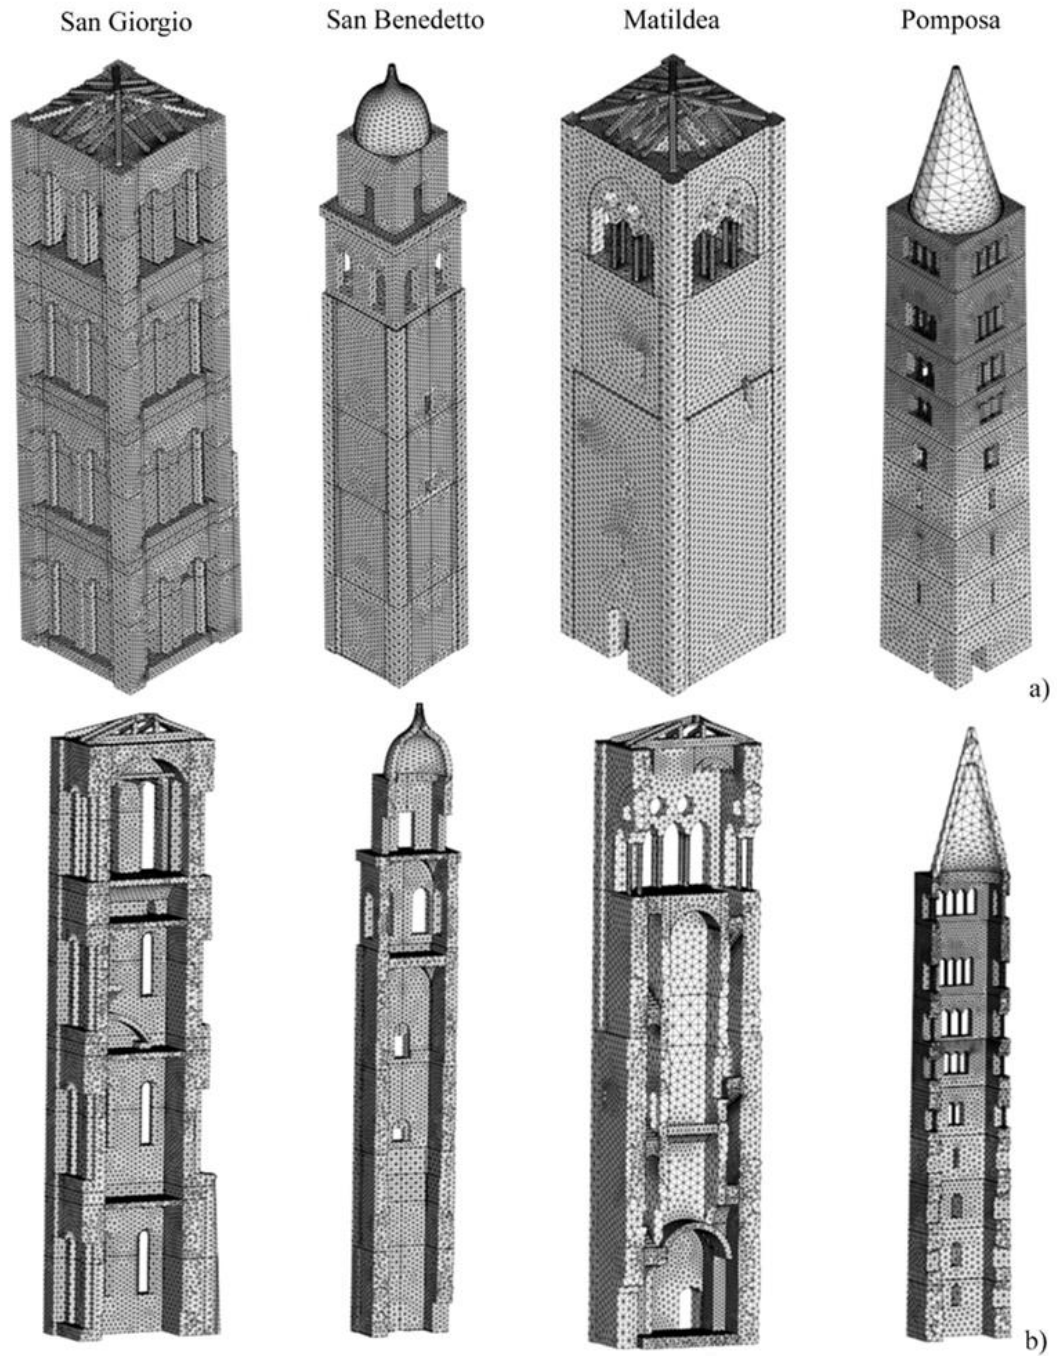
Towers NMs: a) prospective views; b) section views
